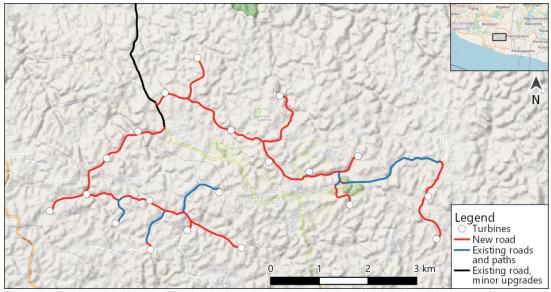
Road layout within site. This layout does not use the existing roads within the villages as major reconstruction is expected.
